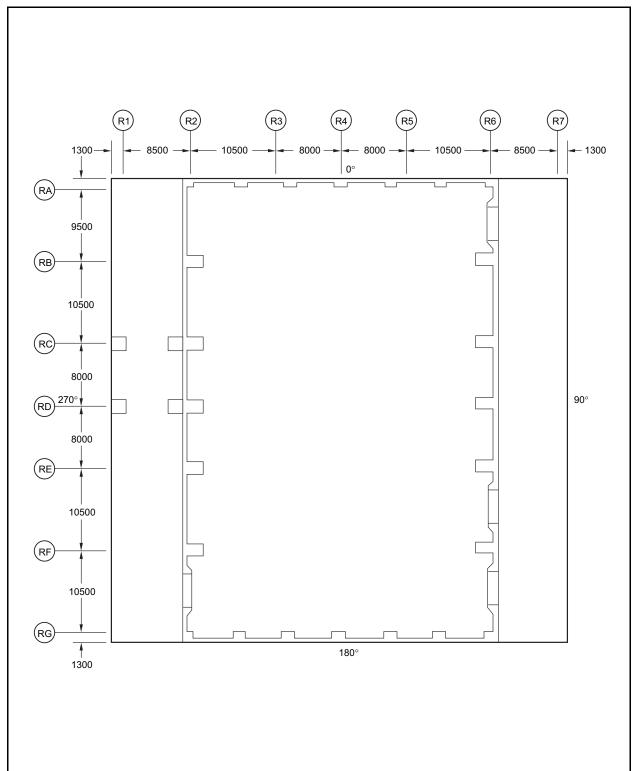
Reactor Building Arrangement Elevation 38200 mm
